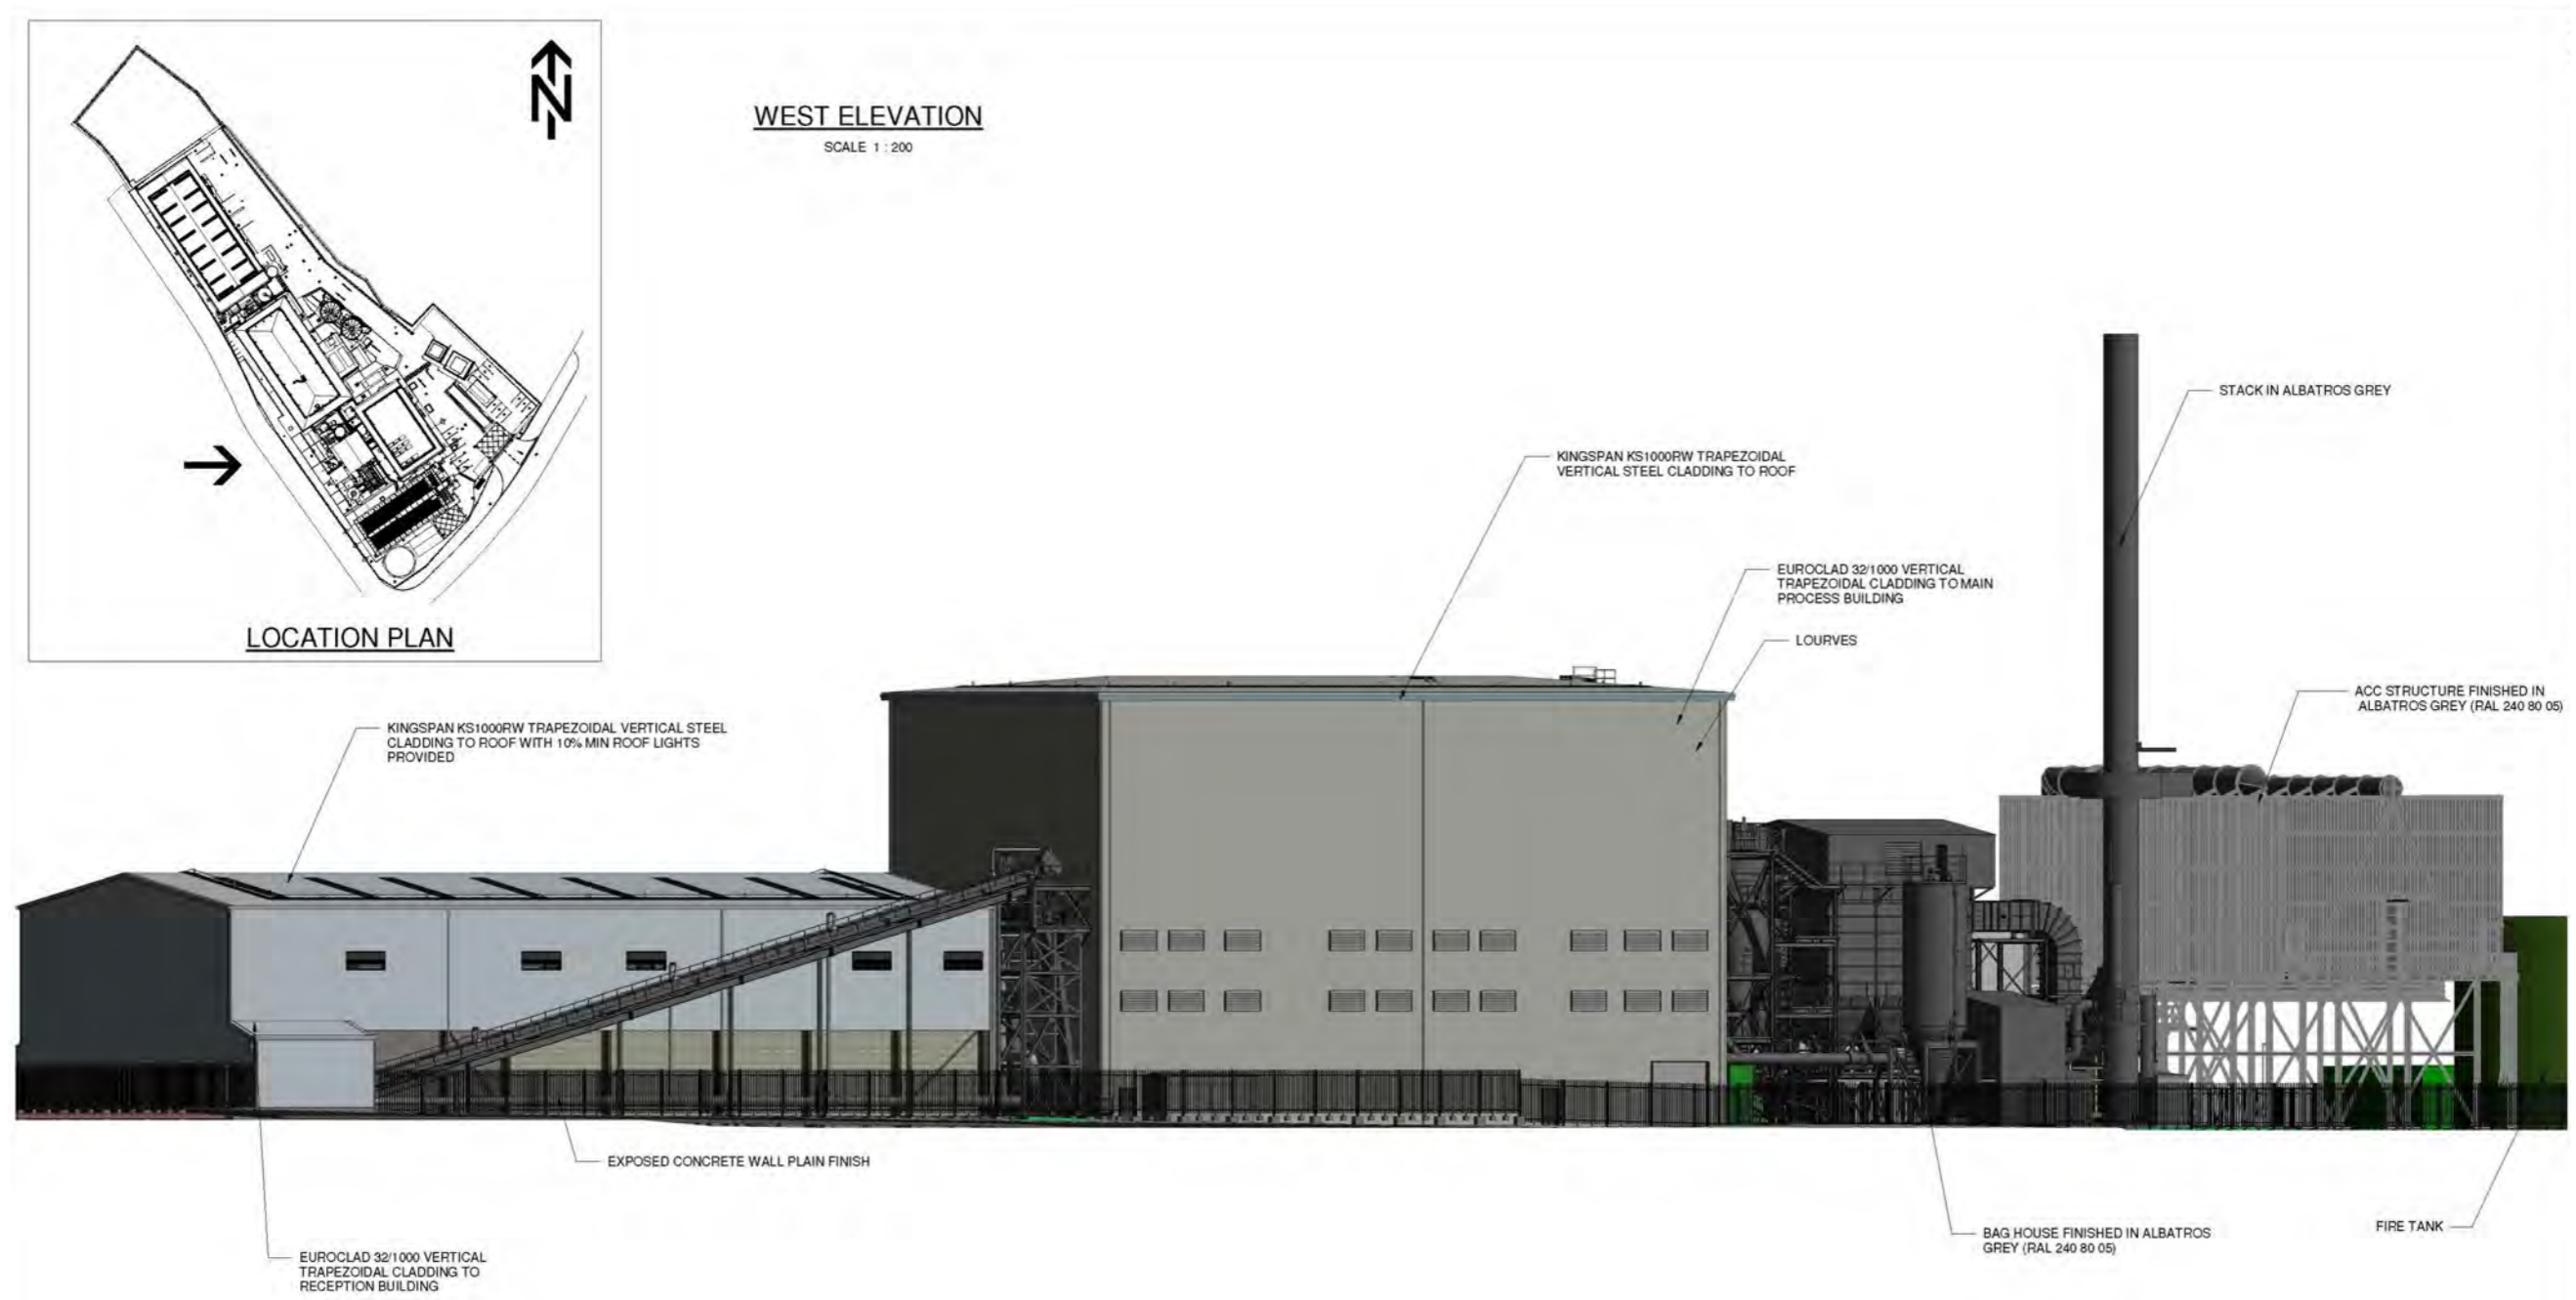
West Elevation—BARRY\_19\_DWG\_01\_40005
